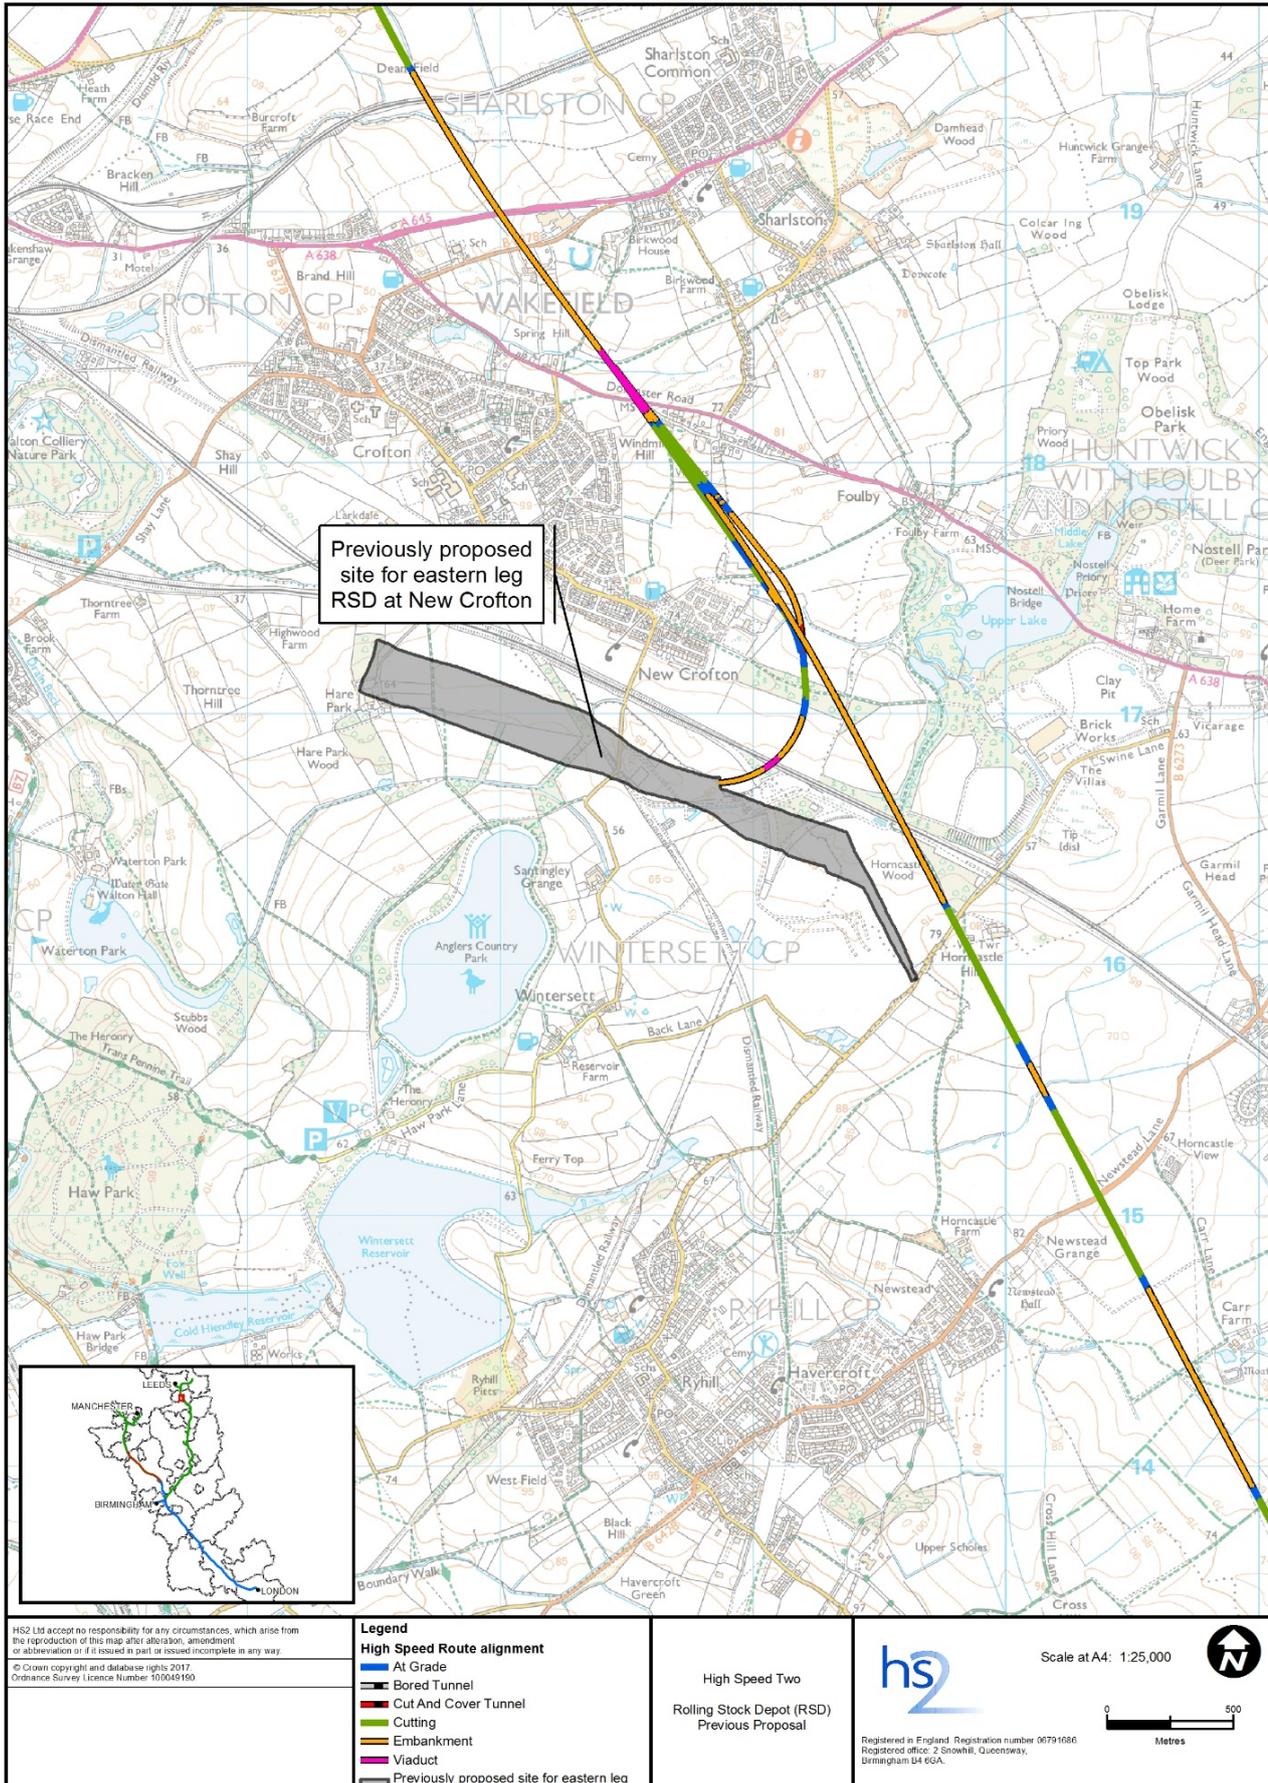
Previously proposed New Crofton RSD location and 2016 alignment
